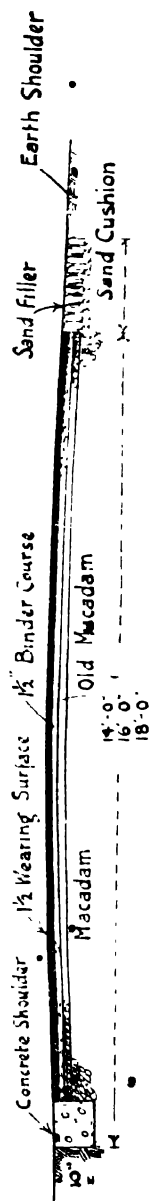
Section of Macadam Road Widened, Strengthened, and Re-surfaced.
